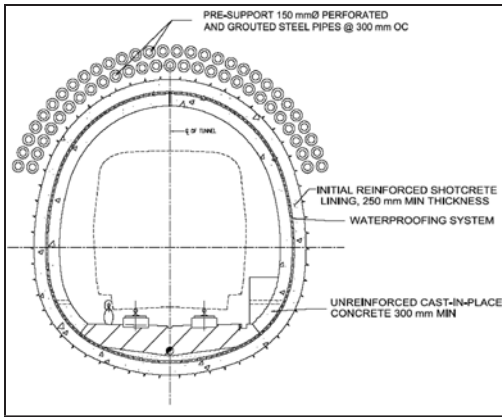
Double pipe arch pre-support for shallow tunneling at International Drive
